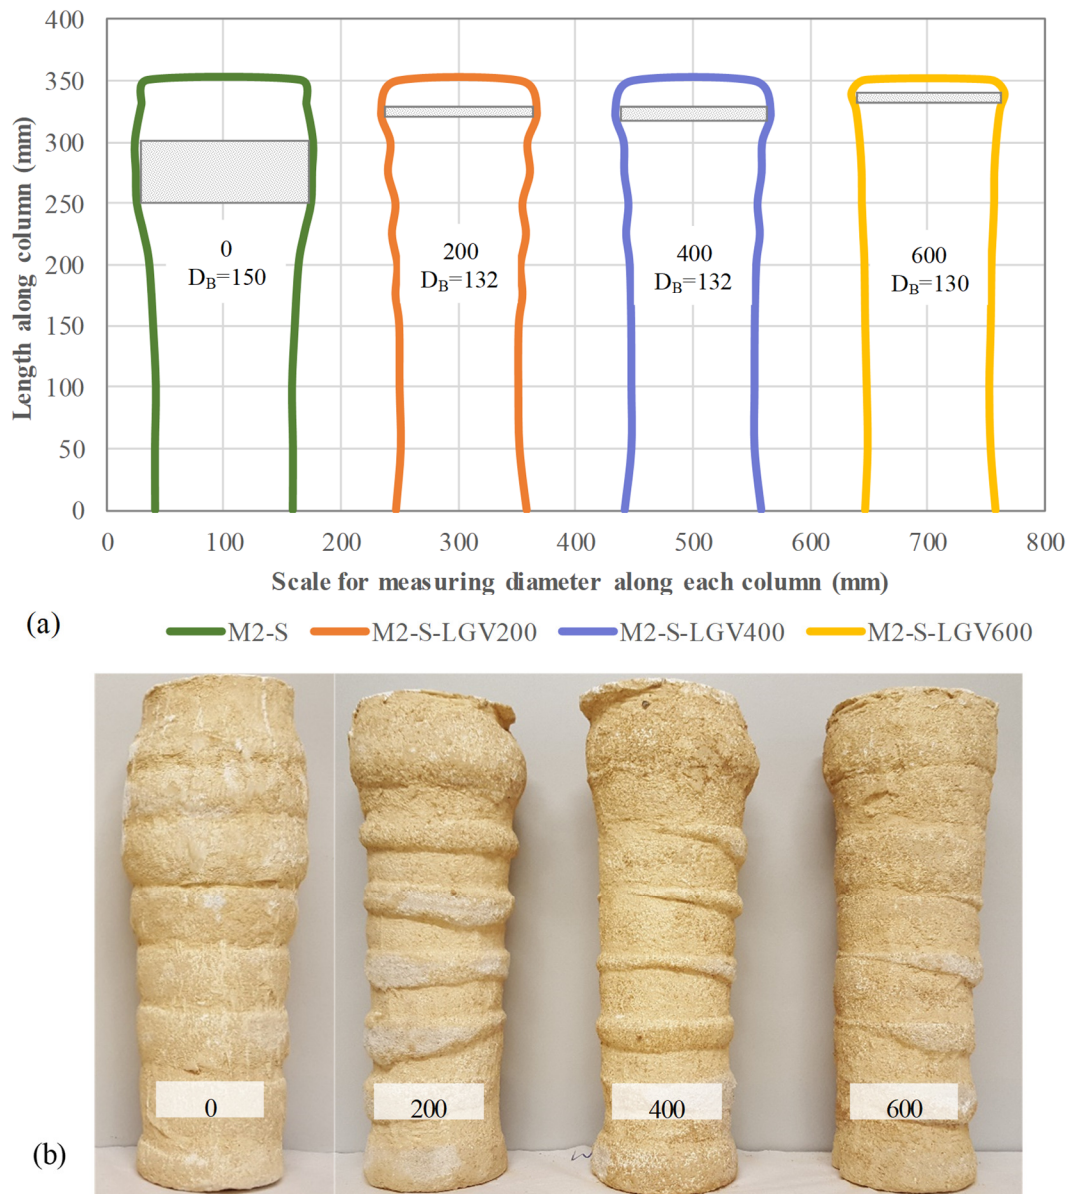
Deformations of tested columns reinforced with layers of Fibertex geotextile (GV), and installed in a base silt at LL, (a) graphical plot and (b) pictorial illustration
